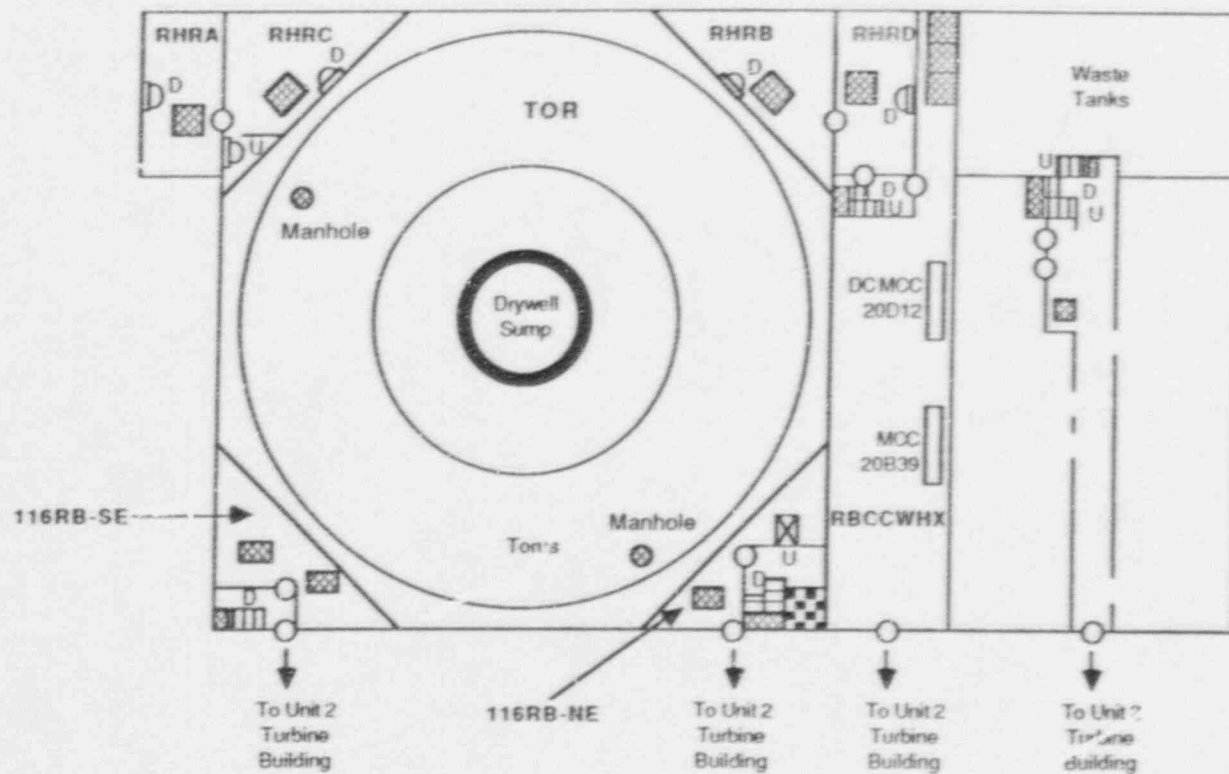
Peach Bottom 2 Reactor and Radwaste Building, Elevation 116'-0"
